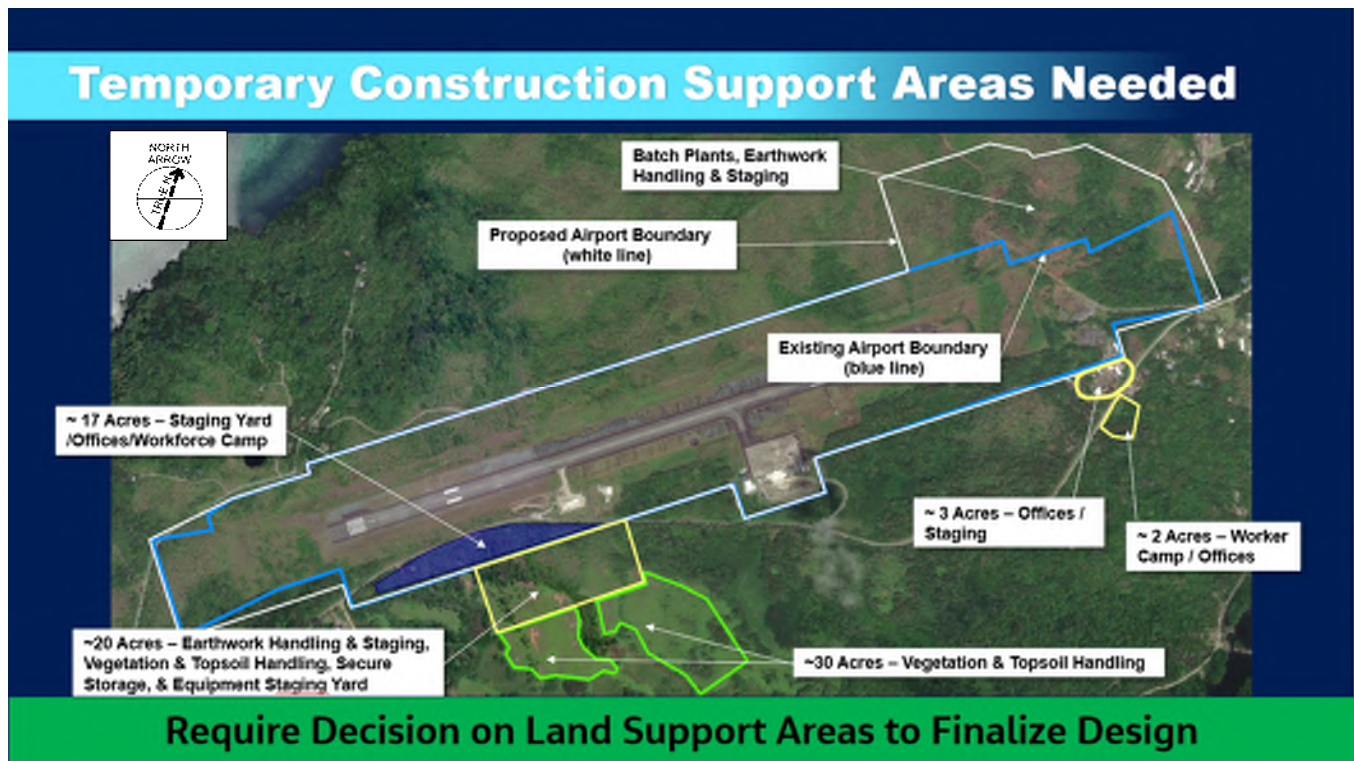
Yap International Airport – Potential Construction Support Area Locations
